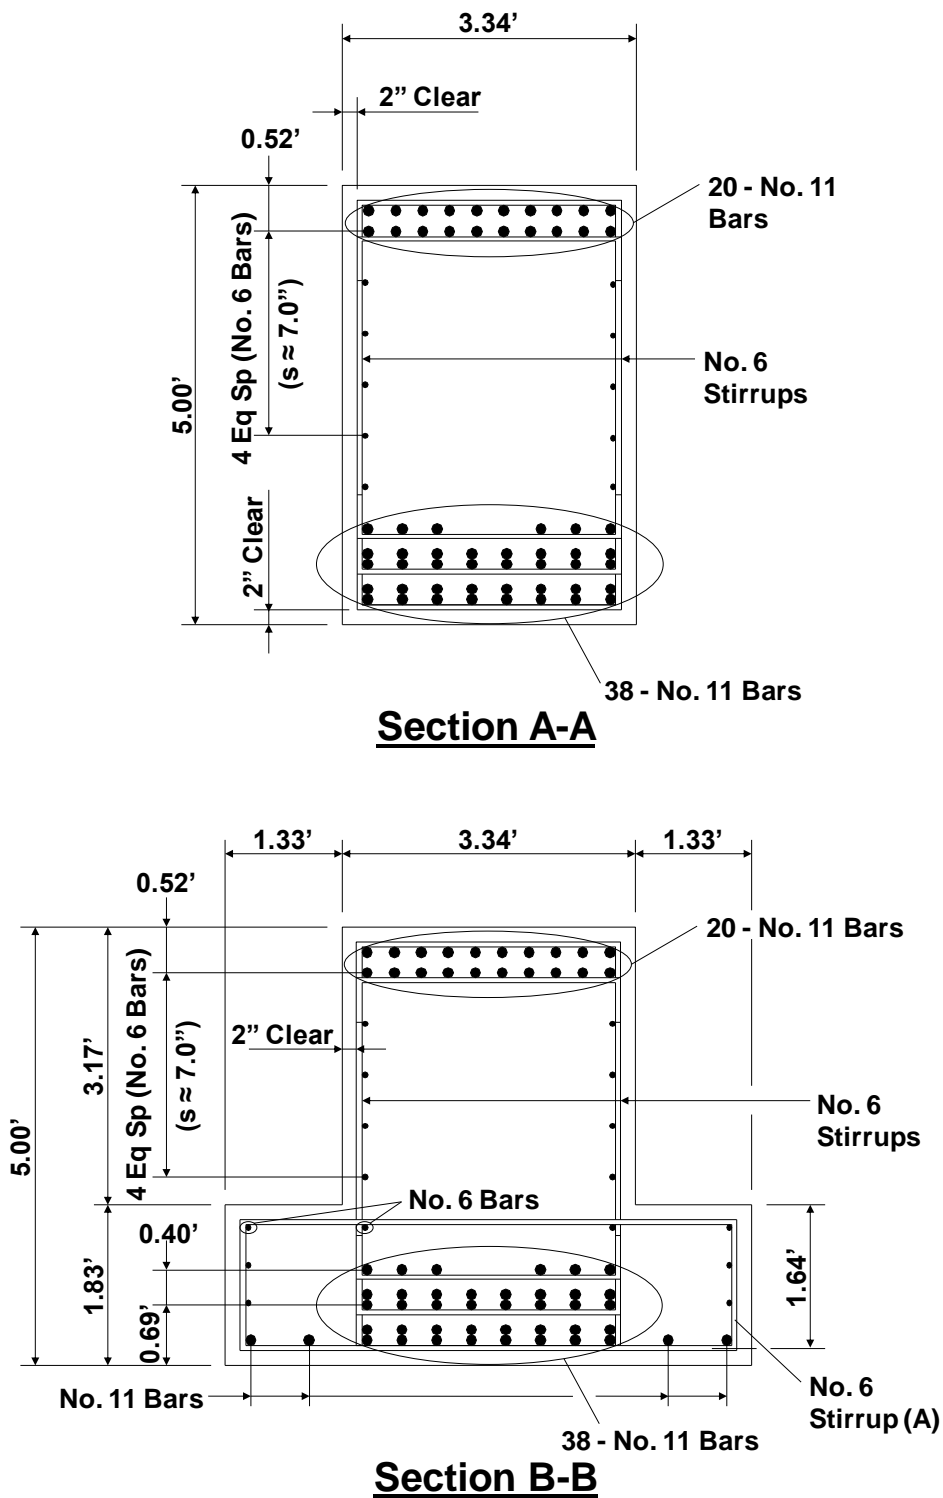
Reinforcement details – cross-sections (design per proposed STM specifications – simply supported case)
